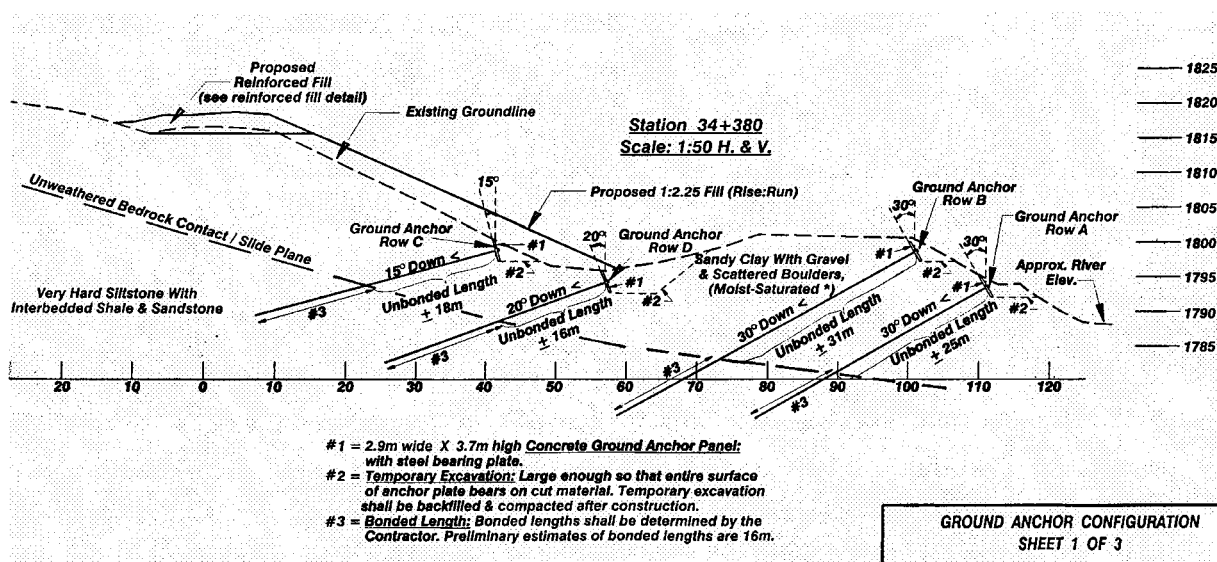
Cross-section with anchors and subsurface conditions, Deer Creek slide stabilization.
